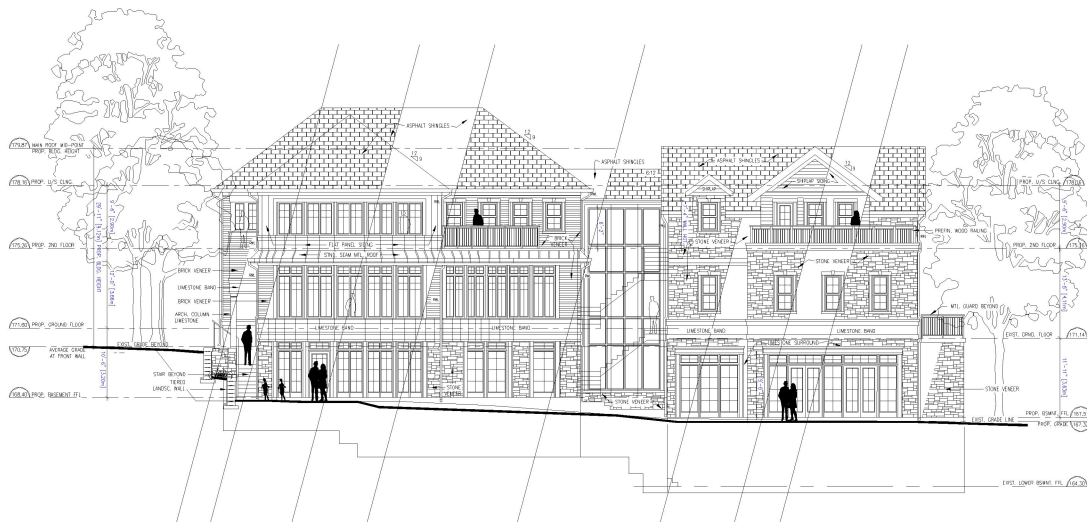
Rear (North) Elevation for proposed new dwelling. This elevation will not be at all visible from the public realm.
